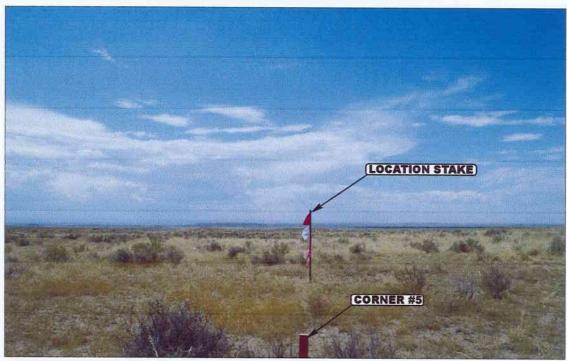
PHOTO: VIEW FROM CORNER #5 TO LOCATION STAKE
